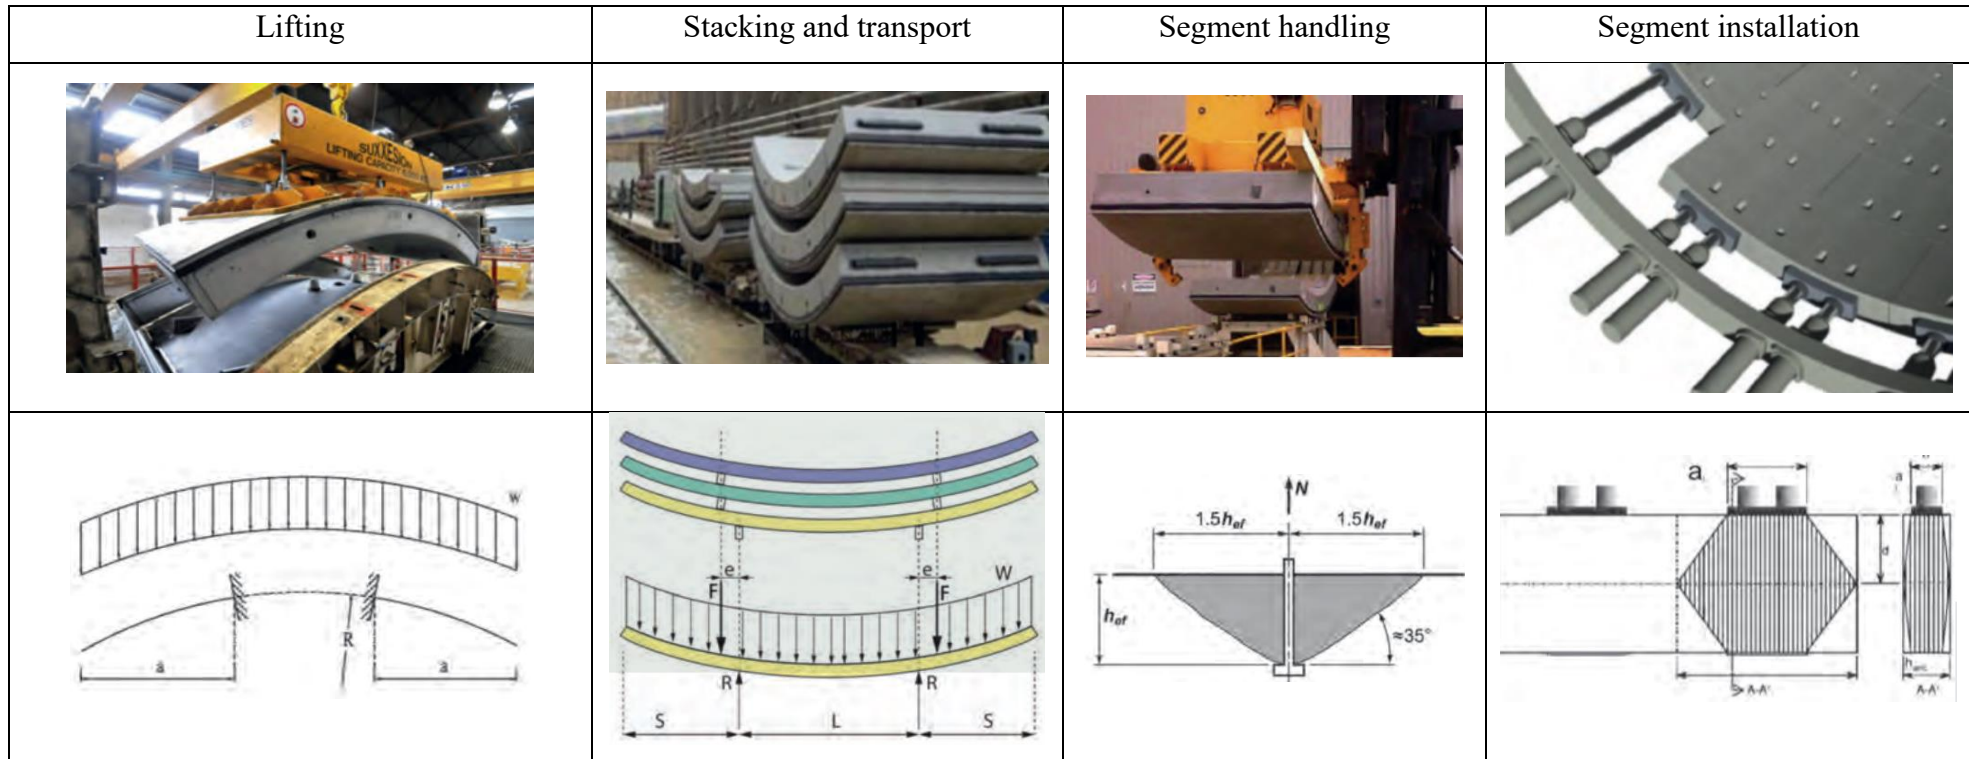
Loadings on tunnel segment pre-construction. The top line shows image of segment during various manipulation pre-construction and the second line show the corresponding structural diagram showing the types of loadings on the segment. The image have been obtained courtesy of ITATech<sup>10</sup>
